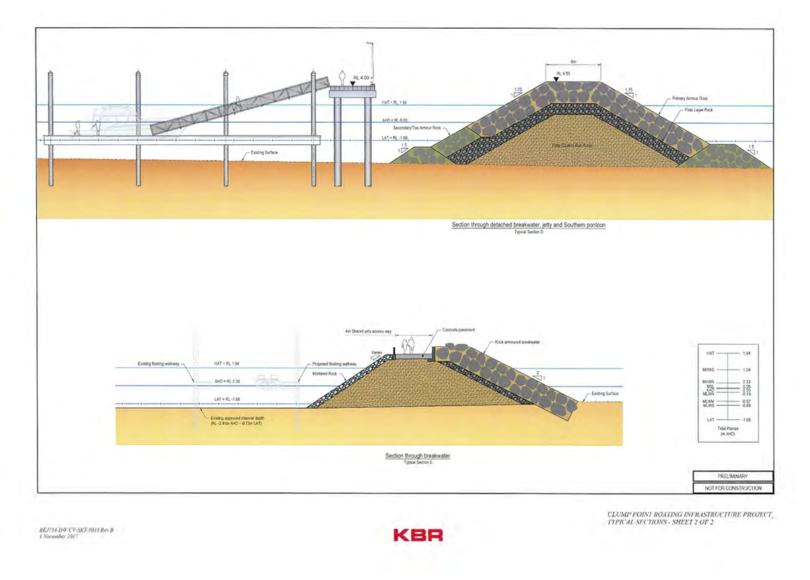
Project Design Cross Section – Breakwaters and Marine Elements
